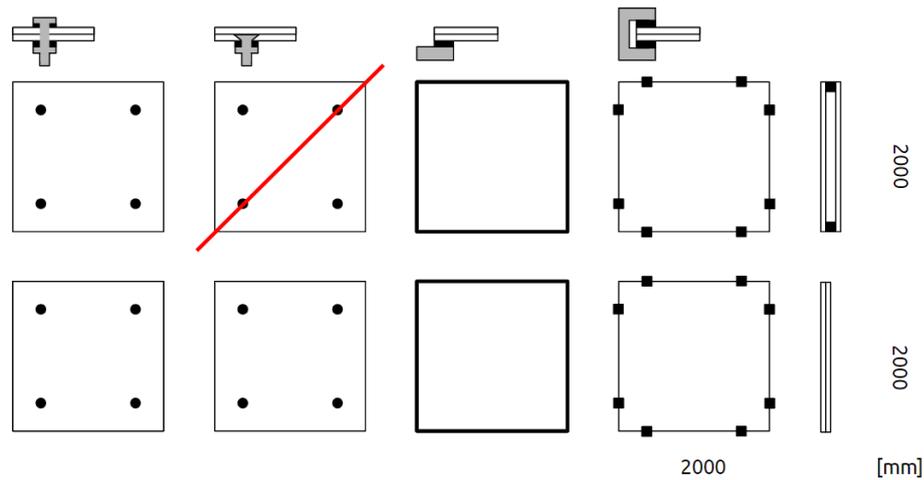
Presumed connection types. From left to right, point fitting, countersunk point fitting, structural sealant and edge clamped.
